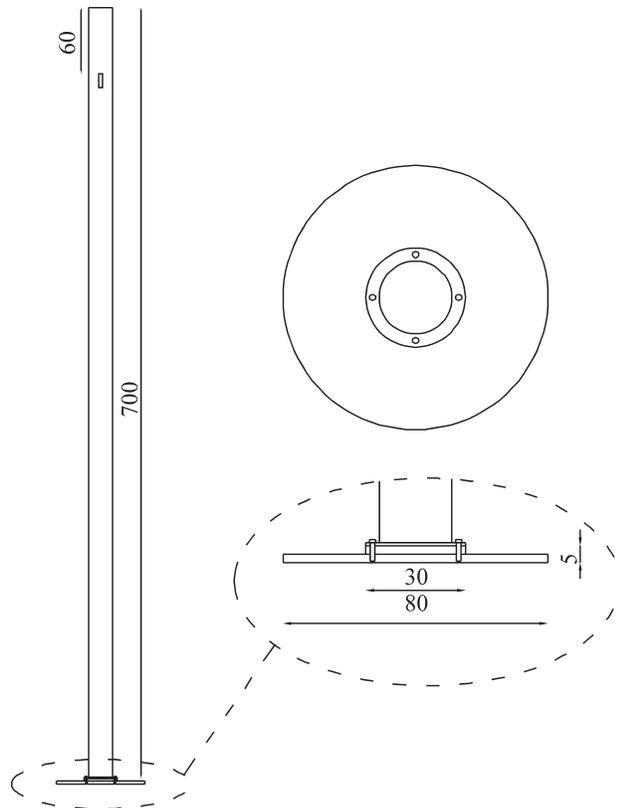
Tube-plate arrangement used in the tests (dimensions in cm).
